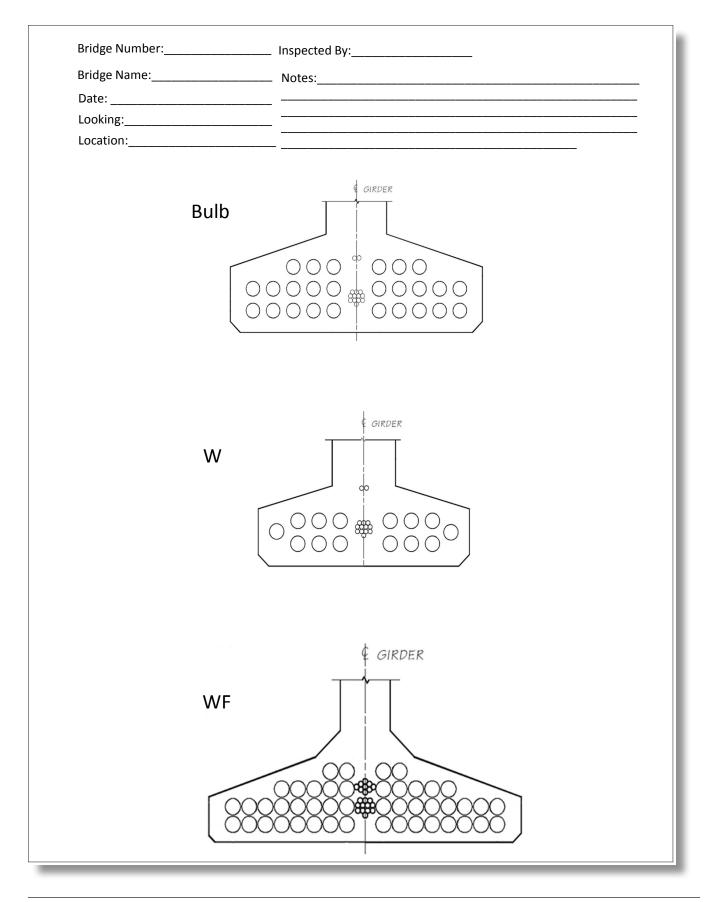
DOT Form 234-048 Girder Elevation Template
